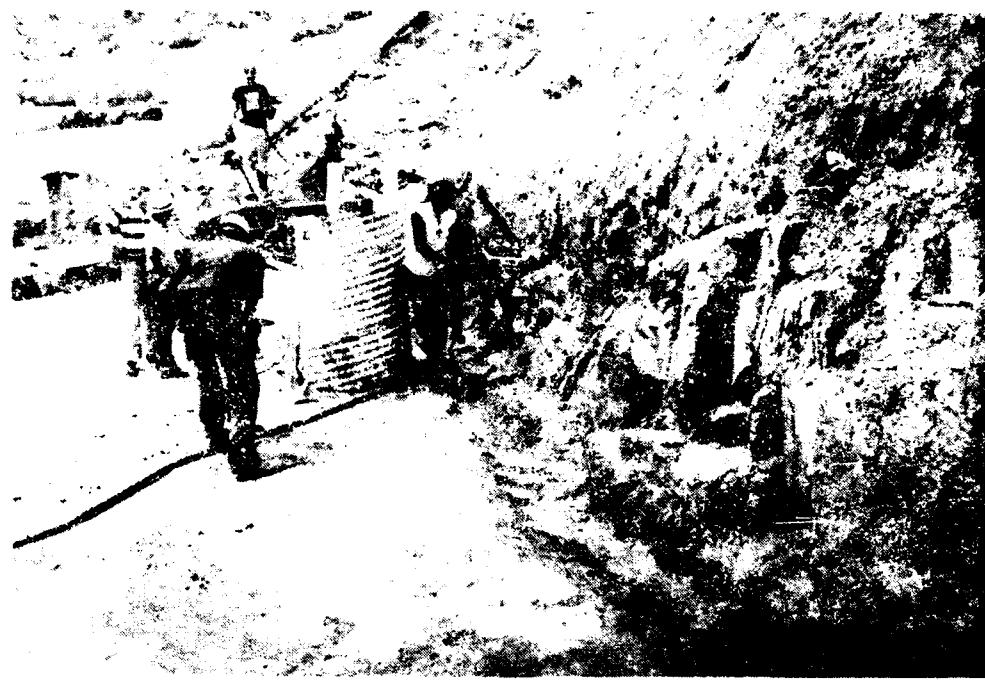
"Bathtub" treatment - compaction coarse filter around area after concrete placement.
